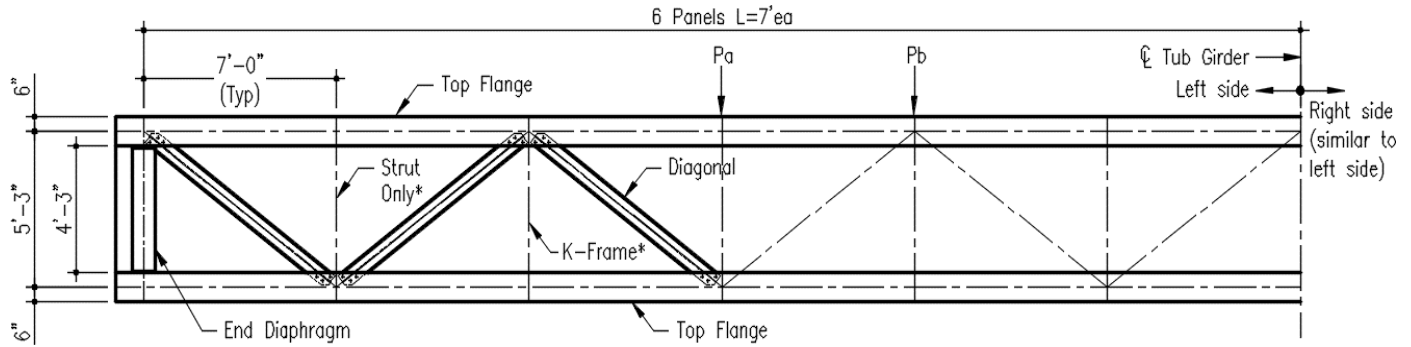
Bracing Layout - Half of Baseline Steel Tub Girder Specimen - Plan View
